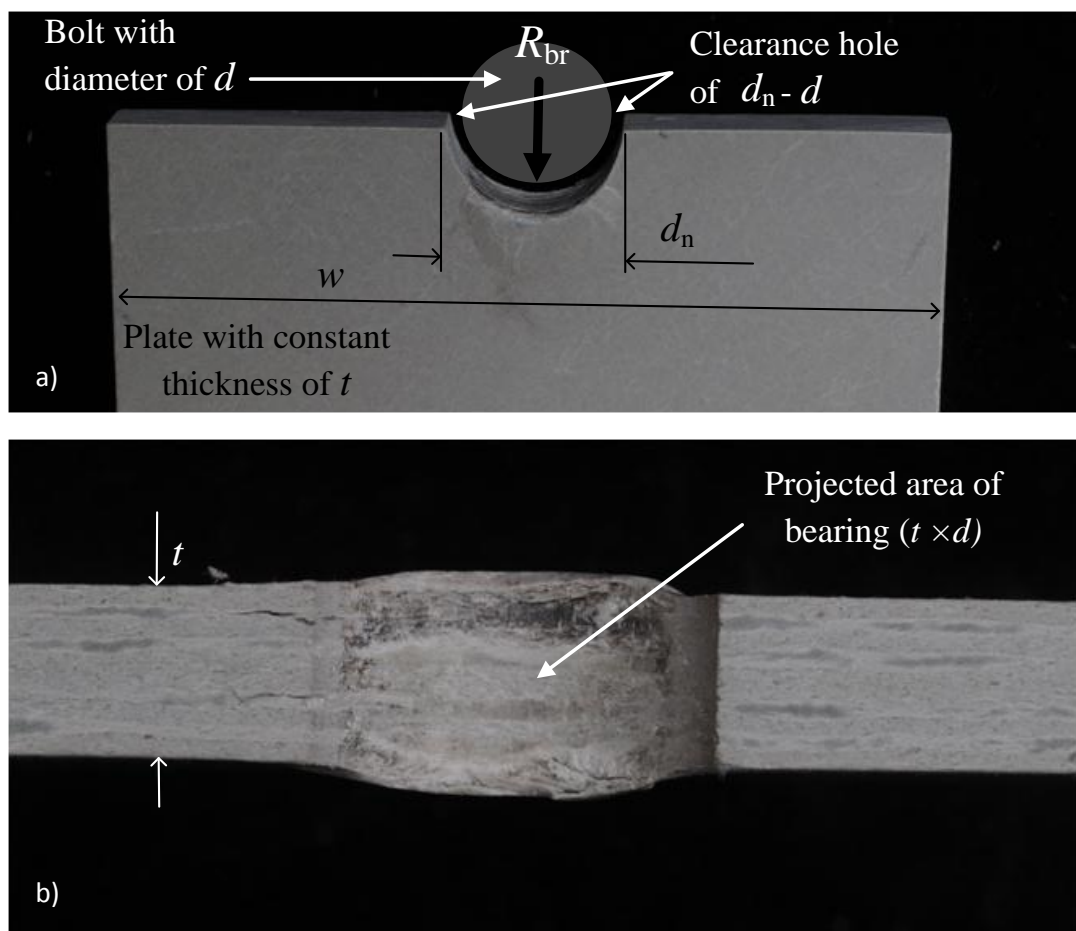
a) bearing failure for a specimen using the University of Warwick (UoW) test method; b) projected bearing area.
